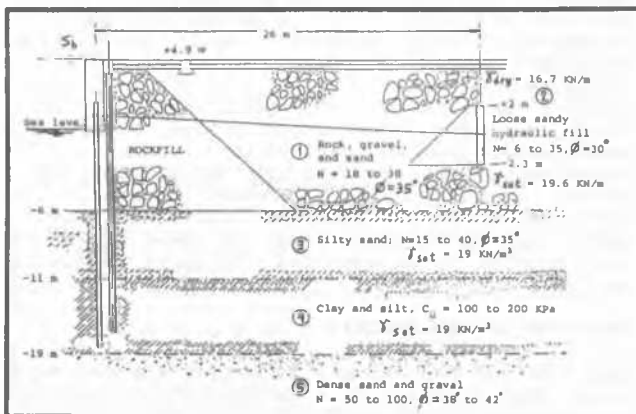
TYPICAL CROSS SECTION OF SITE 3.
